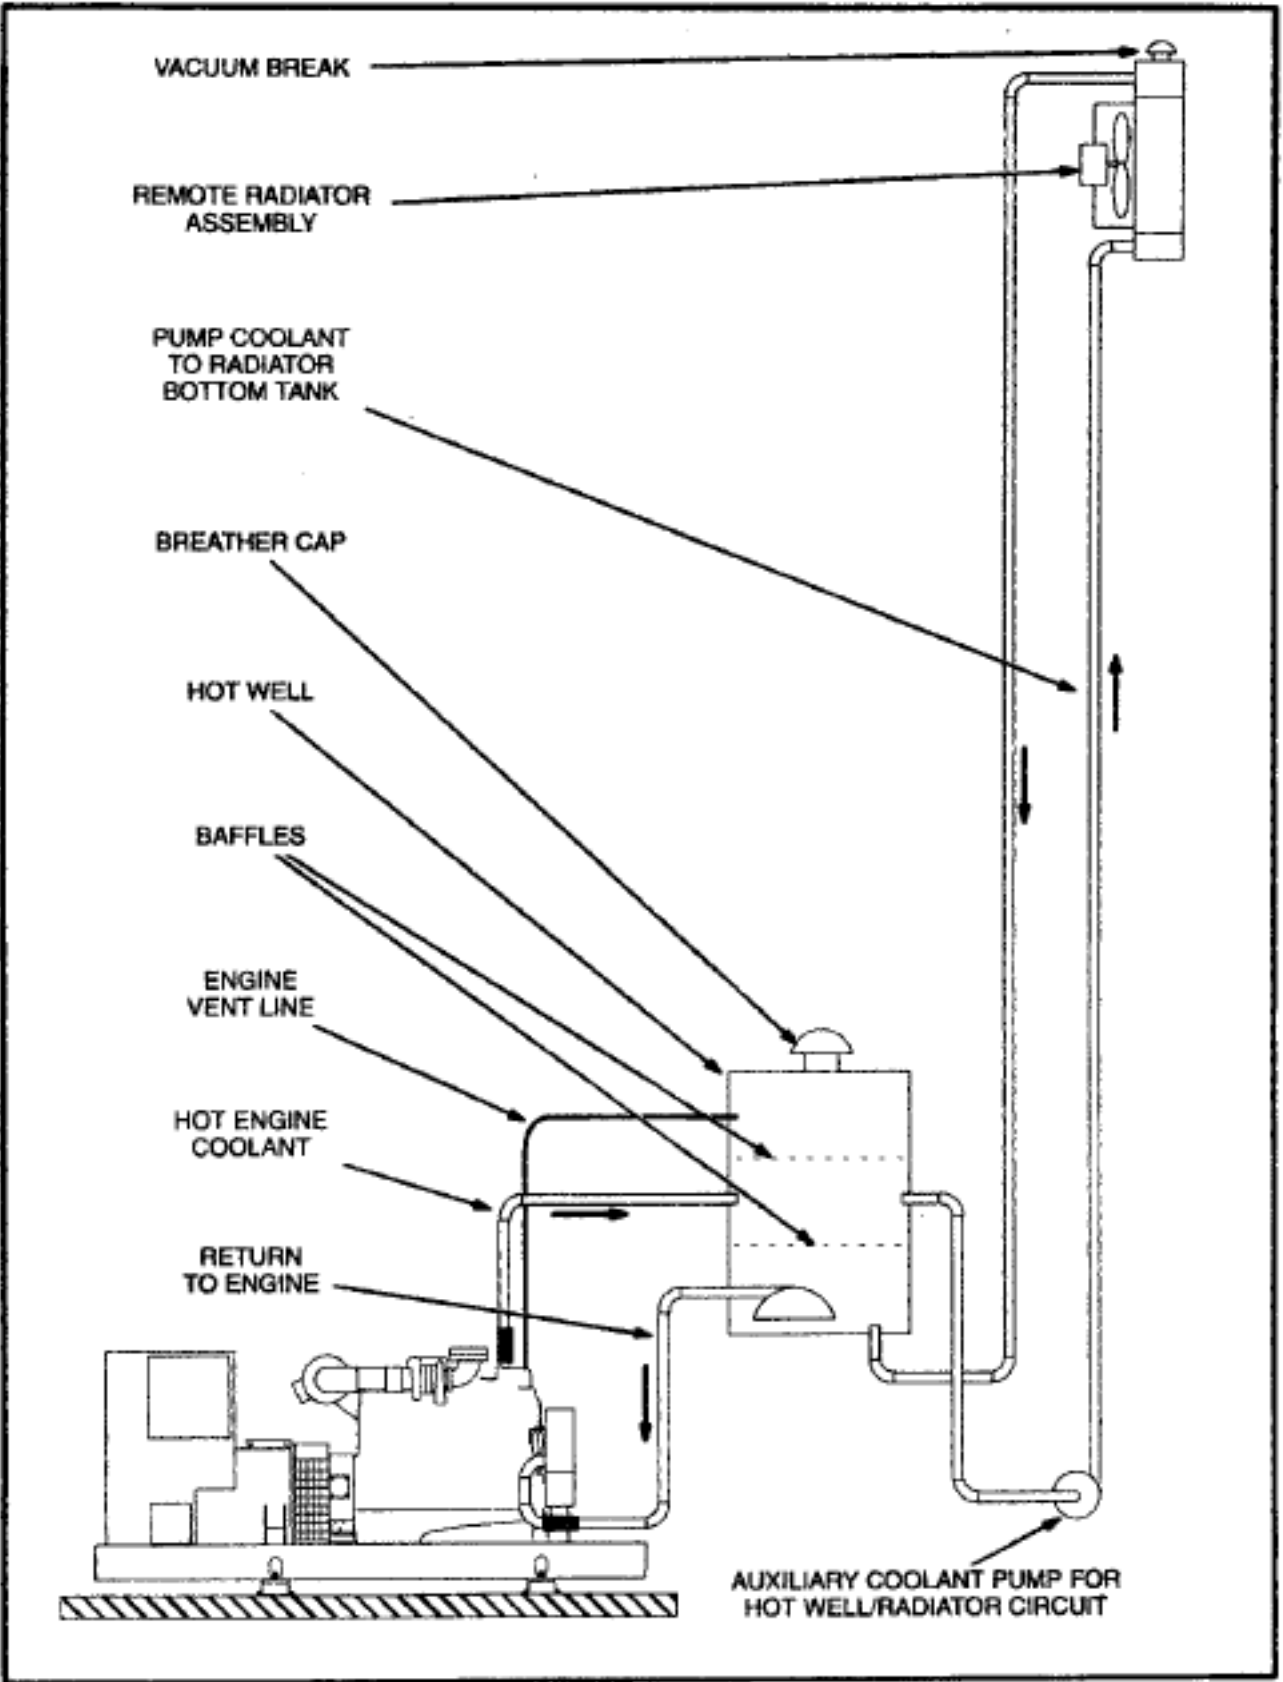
REMOTE RADIATOR WITH HOT WELL AND AUXILIARY COOLANT PUMP
